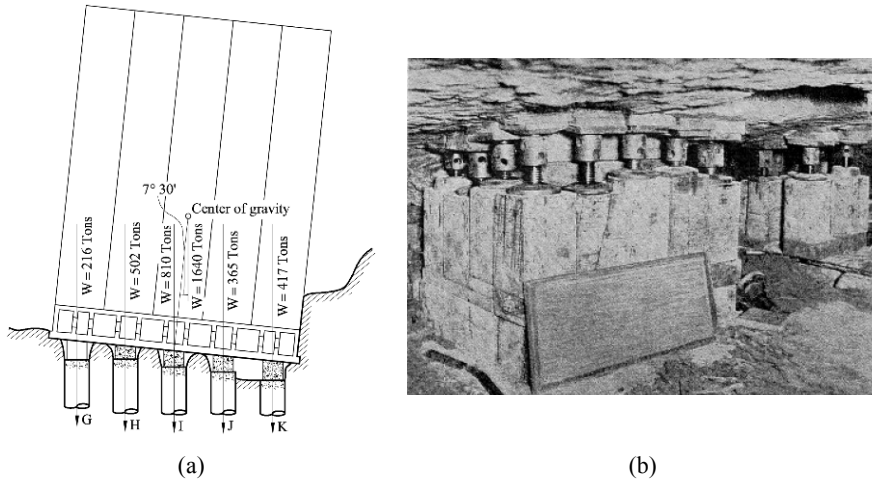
Jacking-up the west (low) side (after Allaire, 1916): (a) a cross-section with the piers; (b) the screw jacking units.
